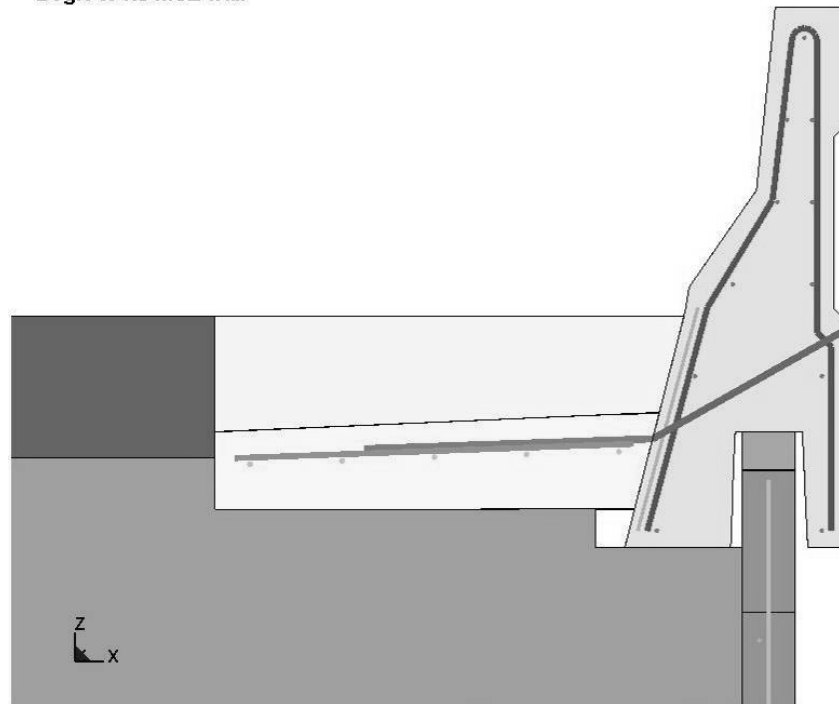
Rebars detail in N.J. barrier and moment slab
